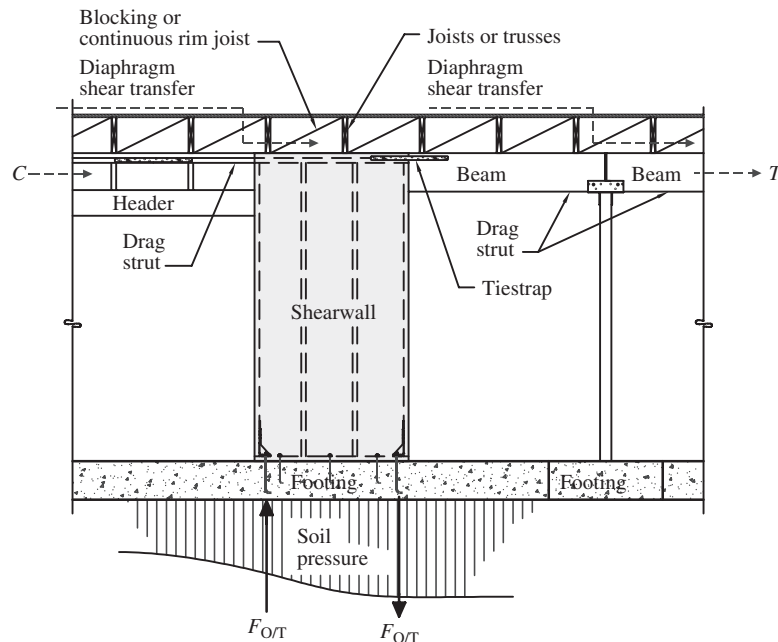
Complete load path to foundation—roof at same elevation.
